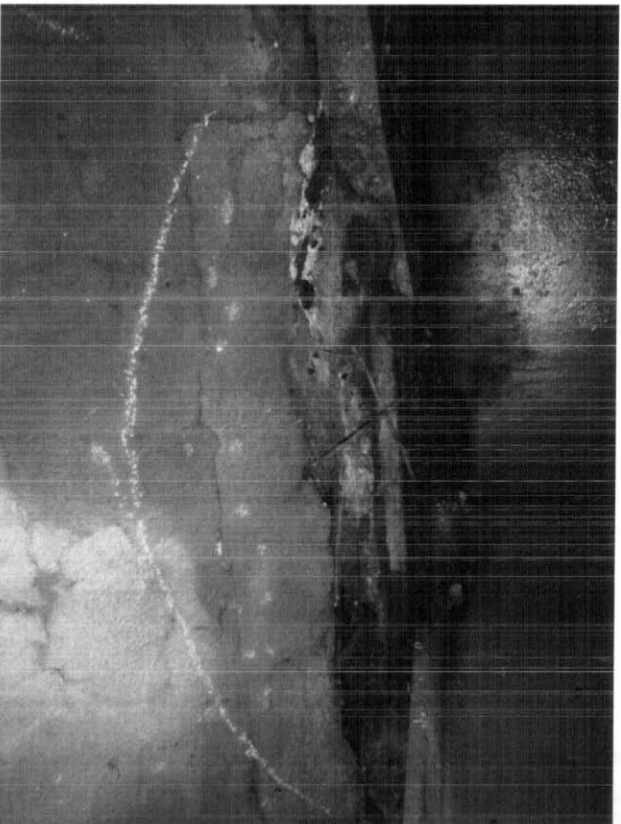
20 IN. X 3 IN. X 2 1/2 IN. SPALL IN ABUTMENT CAP # 2.
